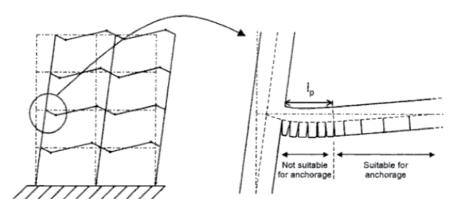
Member cracking assuming a strong-column, weak girder design
